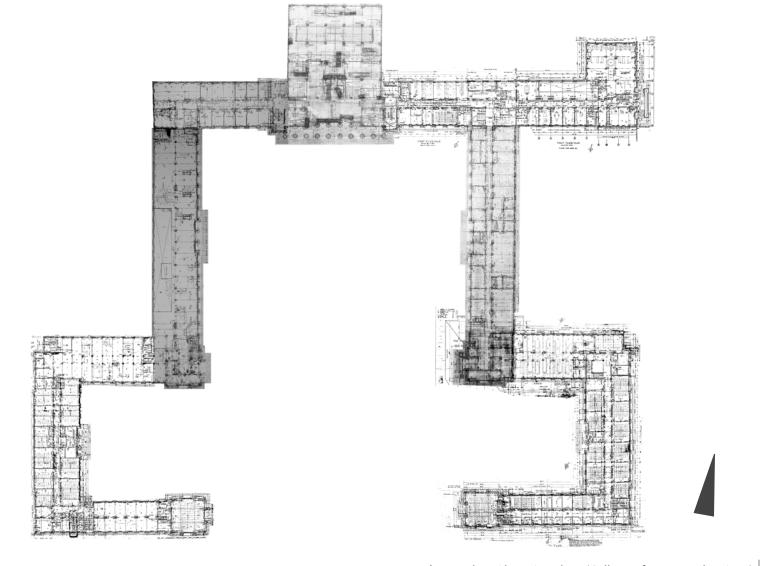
Floor Plan- First Floor (Collage of separate drawings).
